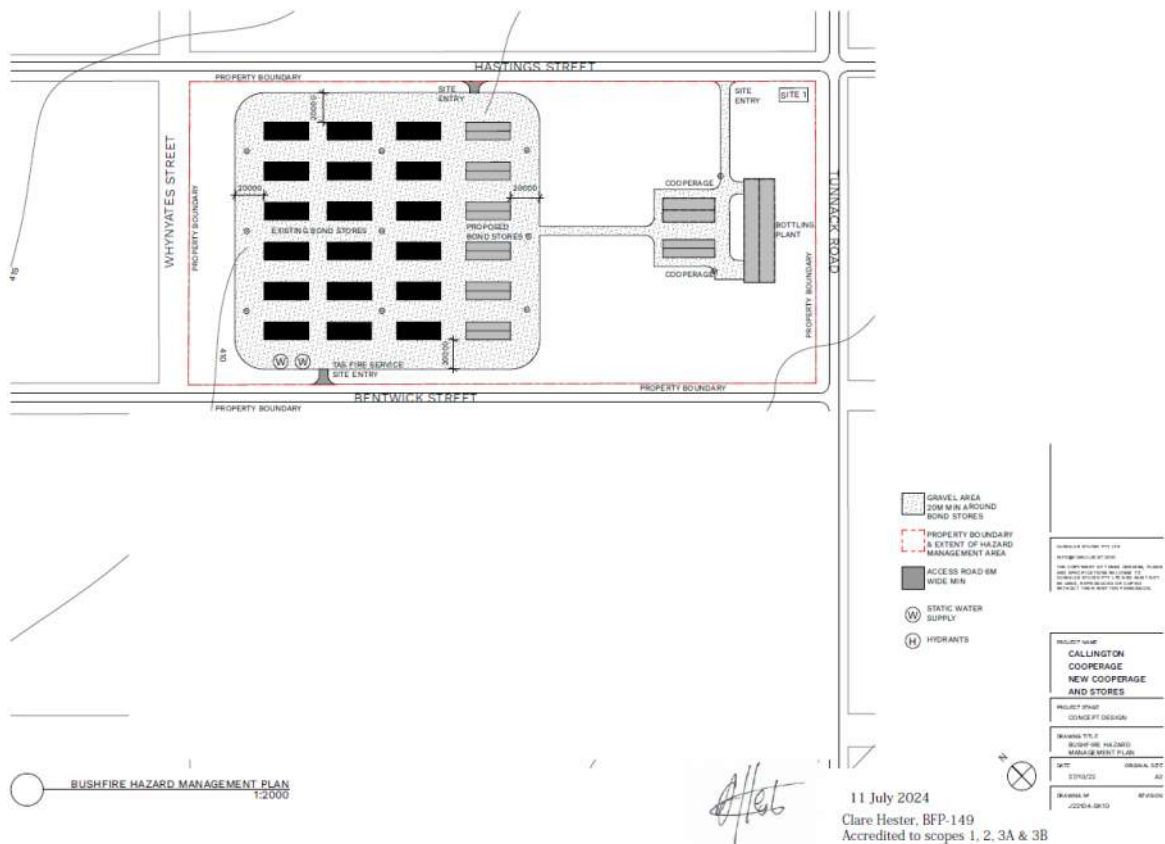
Hazard Management Area for BAL 12.5 construction shown hatched
